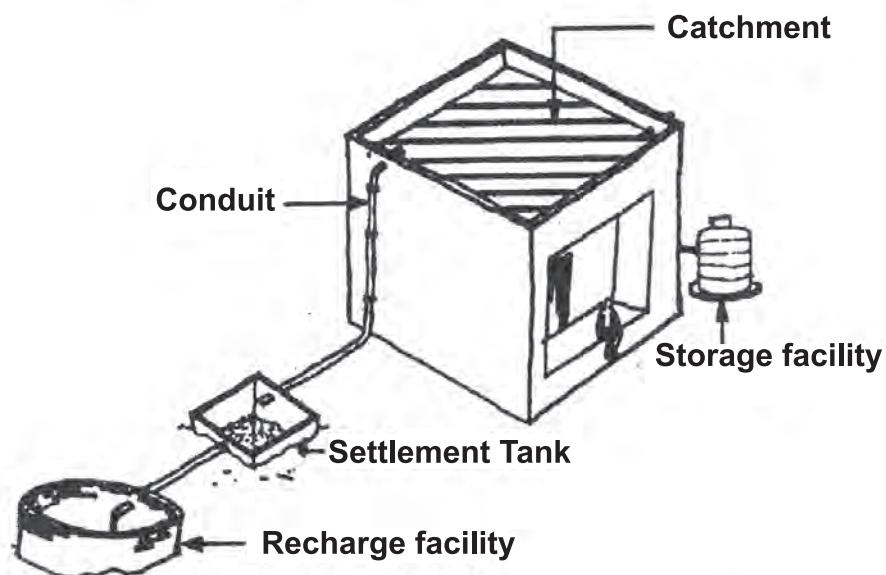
Elements of Typical Rainwater Harvesting System
